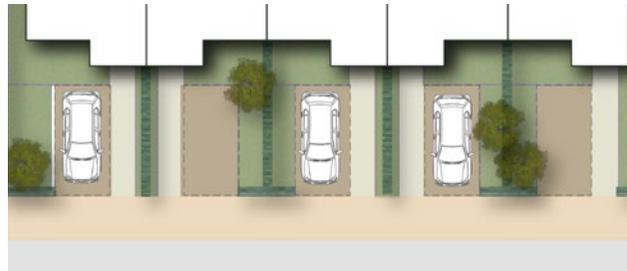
Illustrative diagram showing an indicative layout of on-plot front parking.
